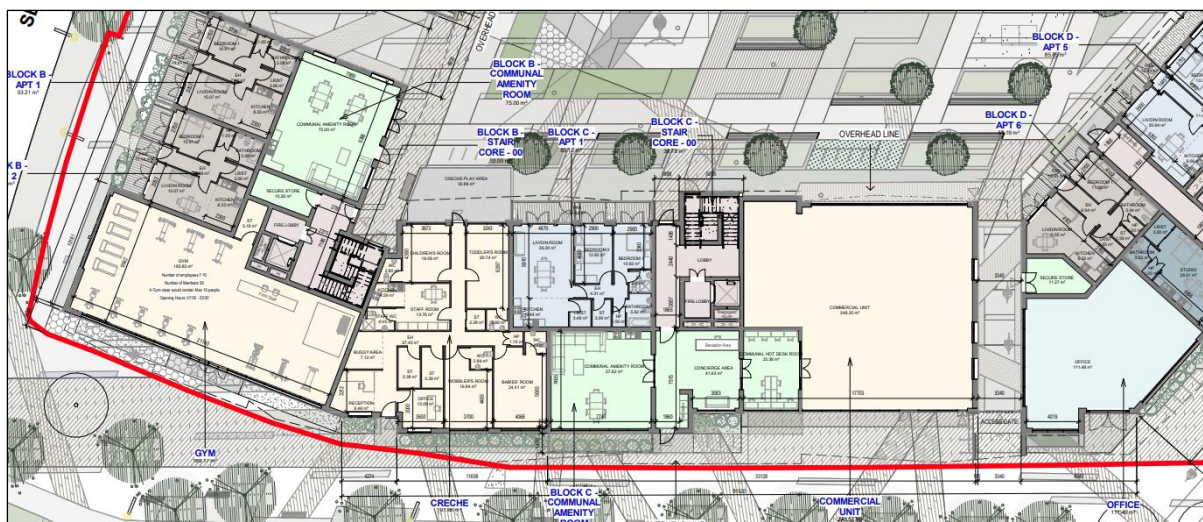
Excerpt from ground floor plan of development approved under ABP Ref. No. 303803-19
